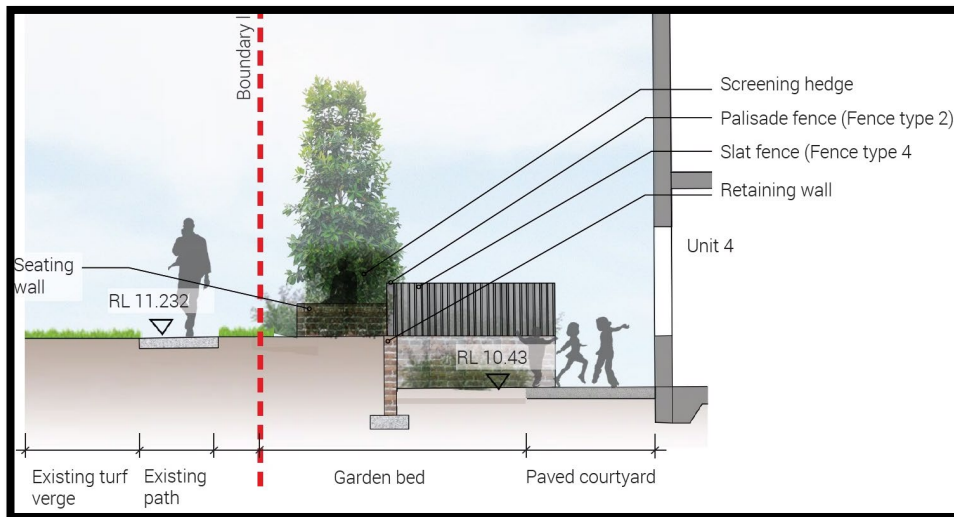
Cross section through private open space areas (Source: Place Design Group)
